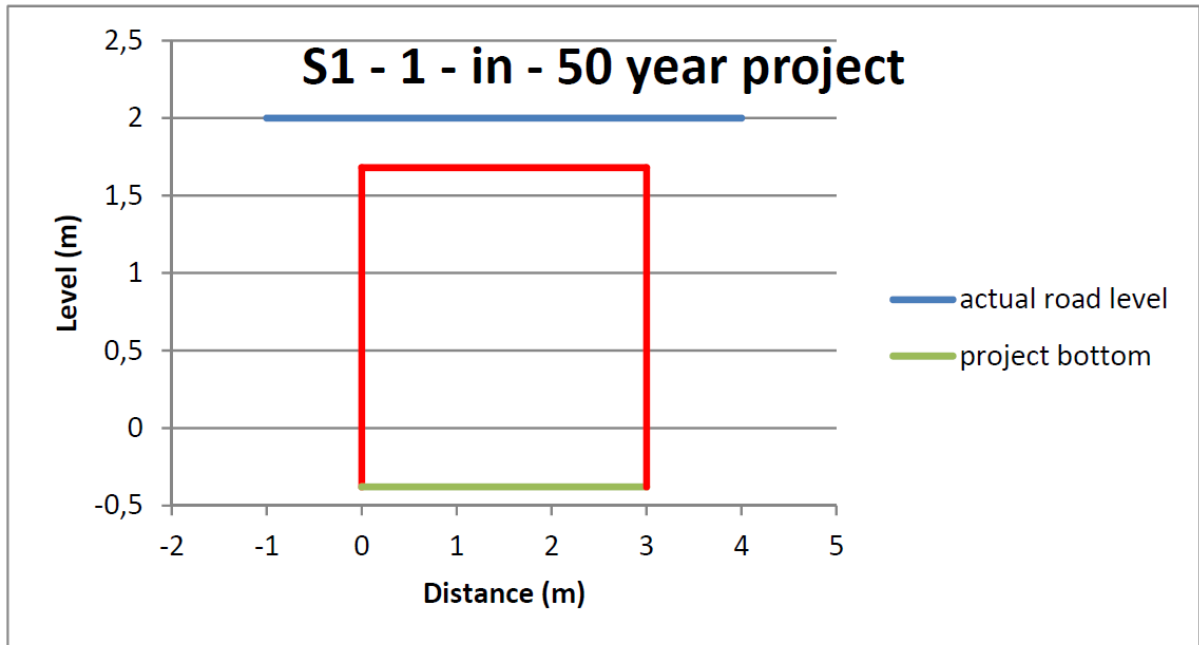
Standard cross section of hydraulic structures under High Street– Sol 1
